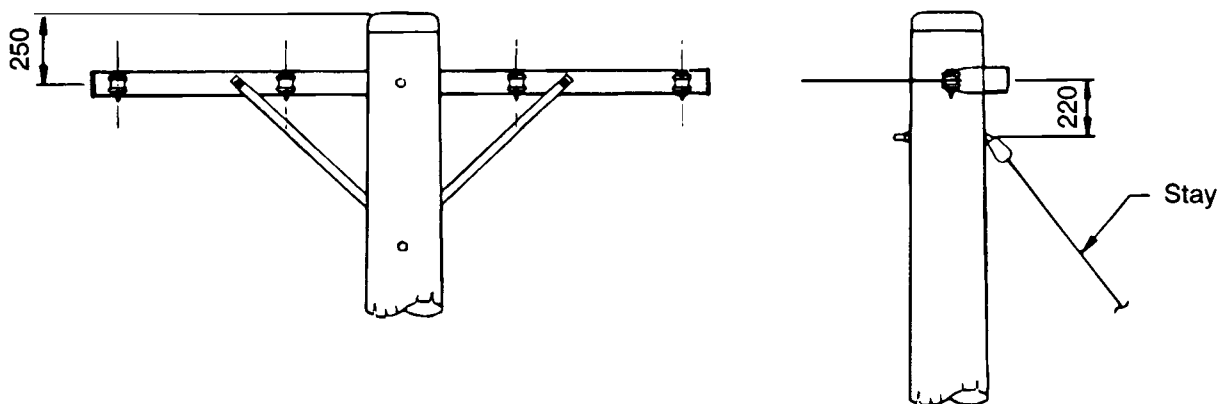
Cable to Open Wire Structure. (Where open wire conductors are terminated and multicore cable is used in the last span to a building or structure)
